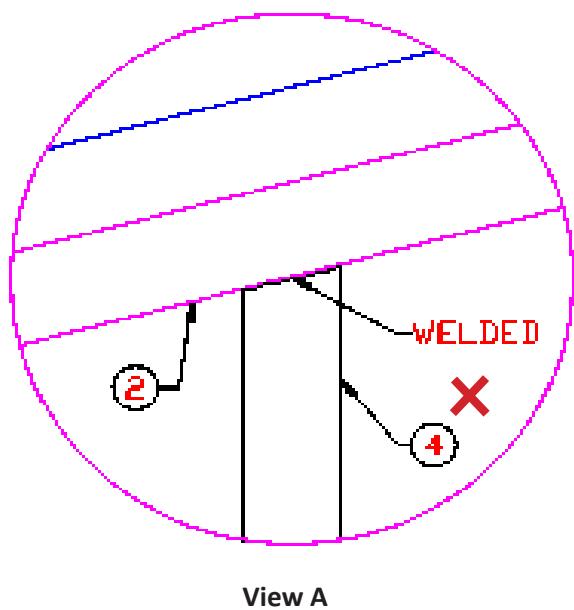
Panel racking arrangement - side view of module support structure
